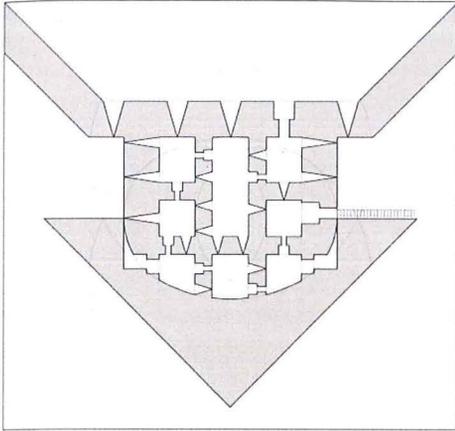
Redrawing of plan from sheet 55 (F. Colonnese)
